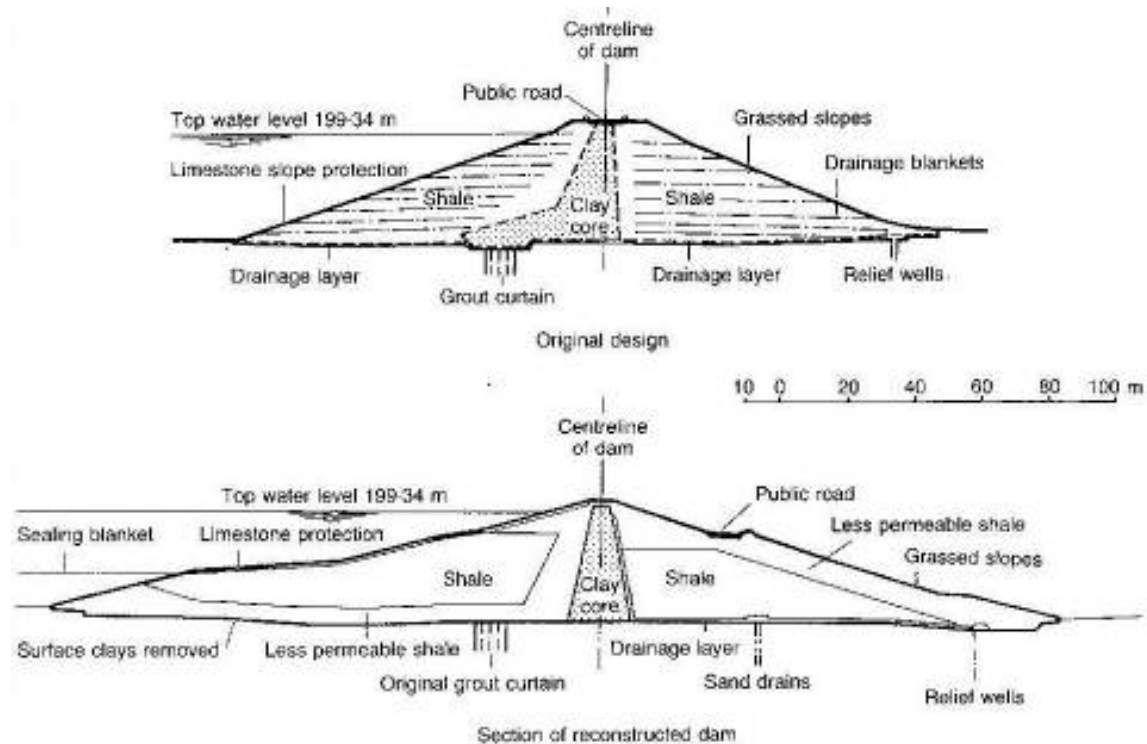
Representative cross sections of the original and reconstructed Carsington Earth Embankment Dam (Banyard et al., 1992).
